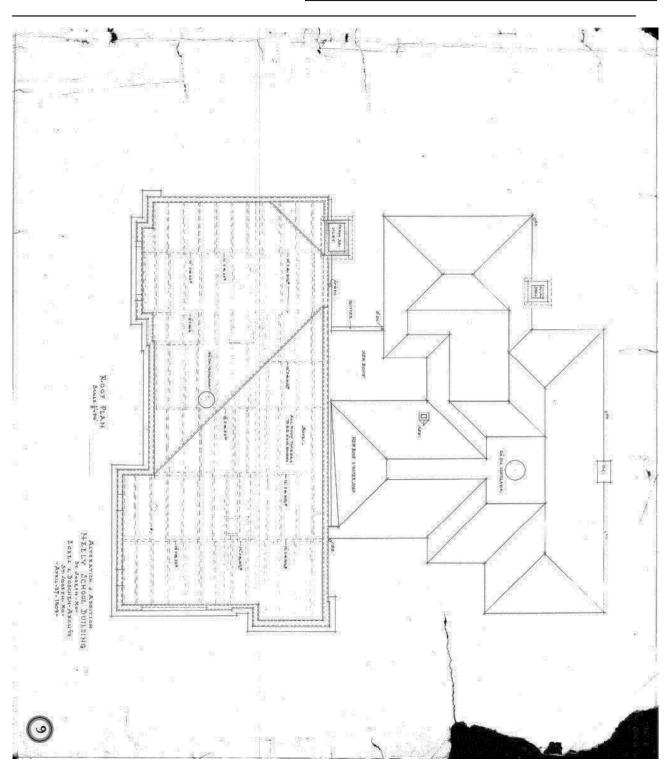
Eckel and Boschen Architects, Roof Plan, April 1909 (Architects 1909)
